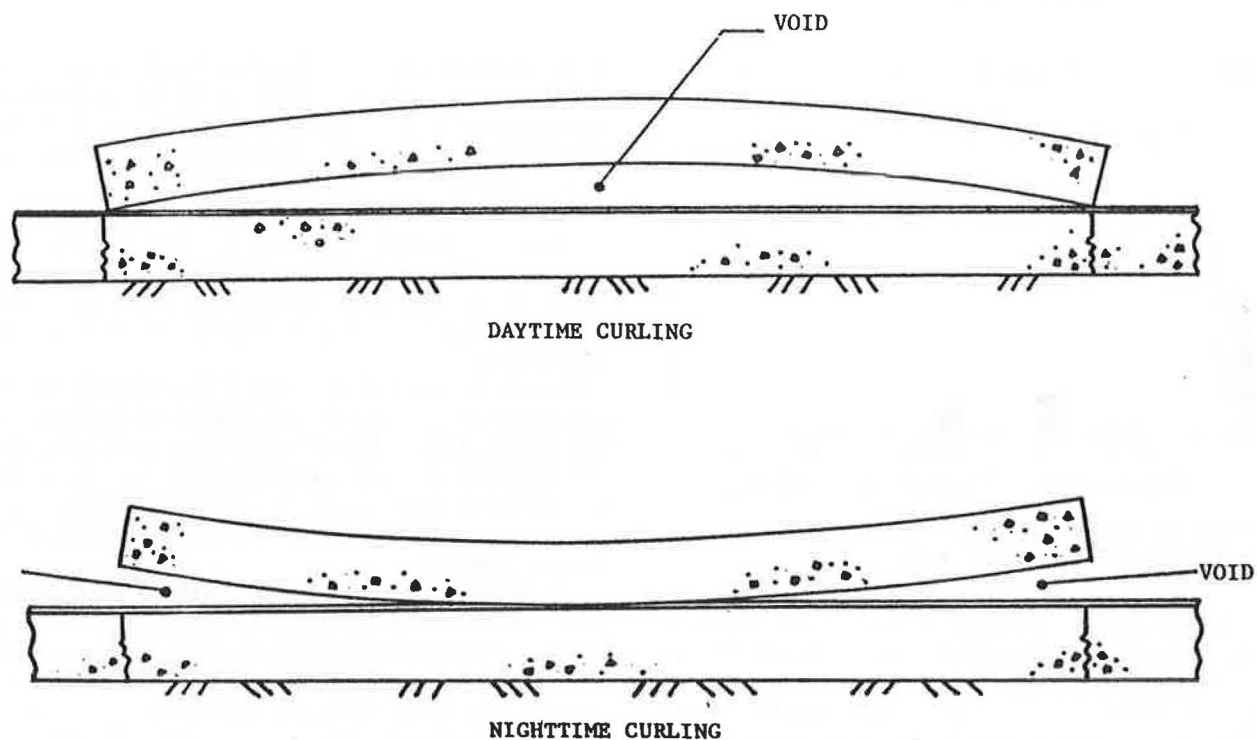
Development of void under unbonded concrete pavements from the differential curling phenomenon.
